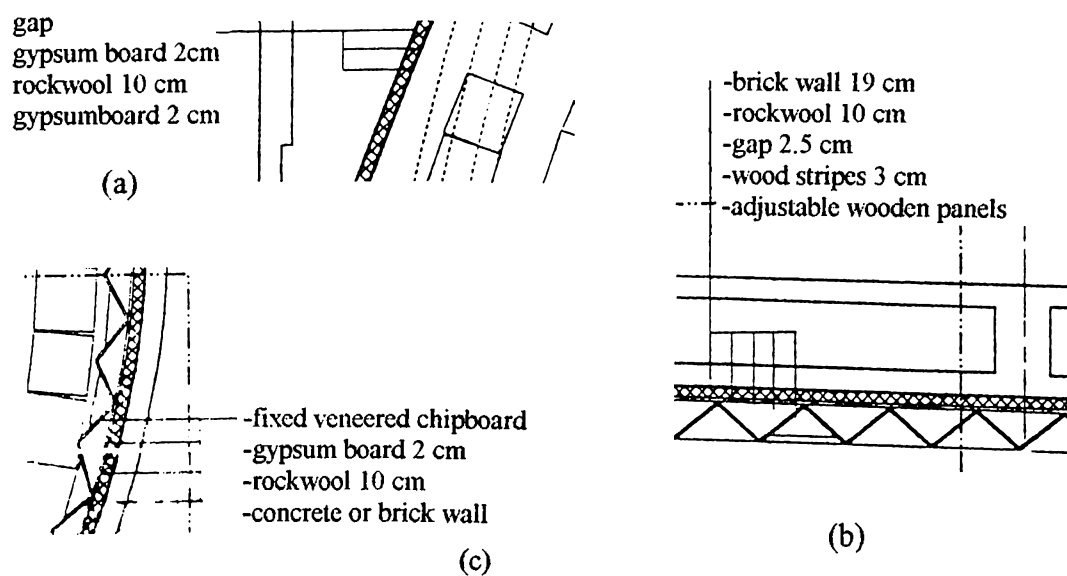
The materials and their application (a) for the back wall, (b) side walls, (c) for the wall behind the seats reserved for the chorus at the balcony floor of the concert hall.
